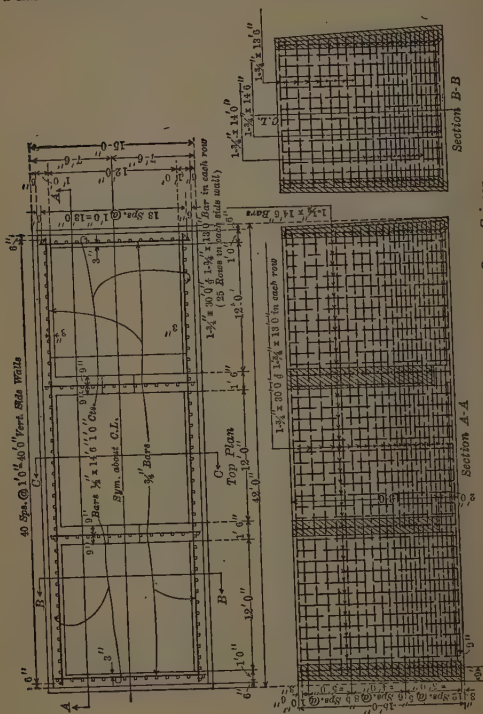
Shallow Reinforced-Concrete Open Caisson
